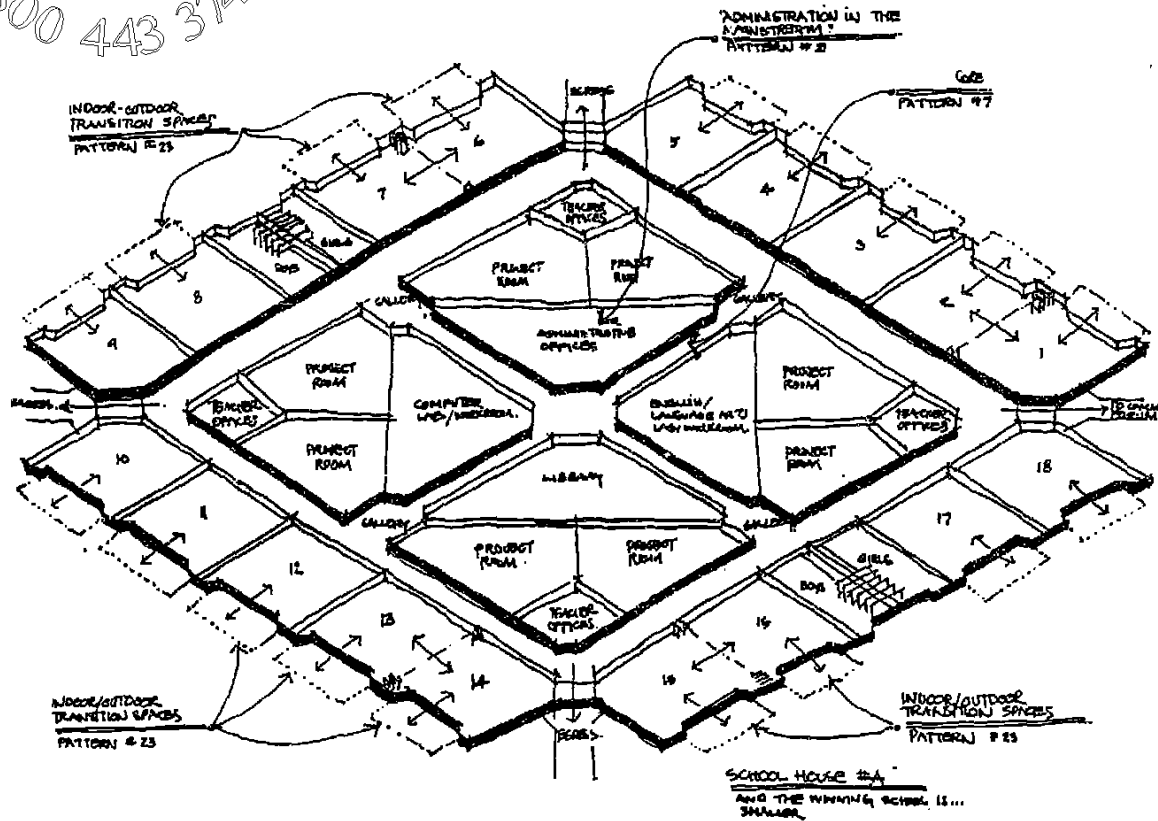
Prototype design for the new schoolhouse: House plan.
